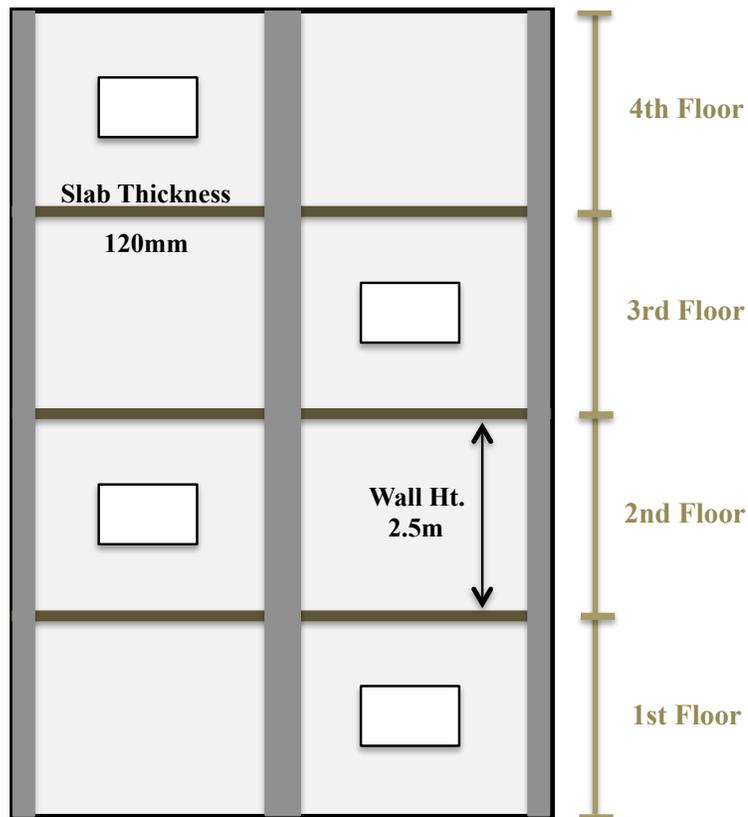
A Schematic of a Side Elevation of a Typical Middle-Income Residential Building in Egypt
